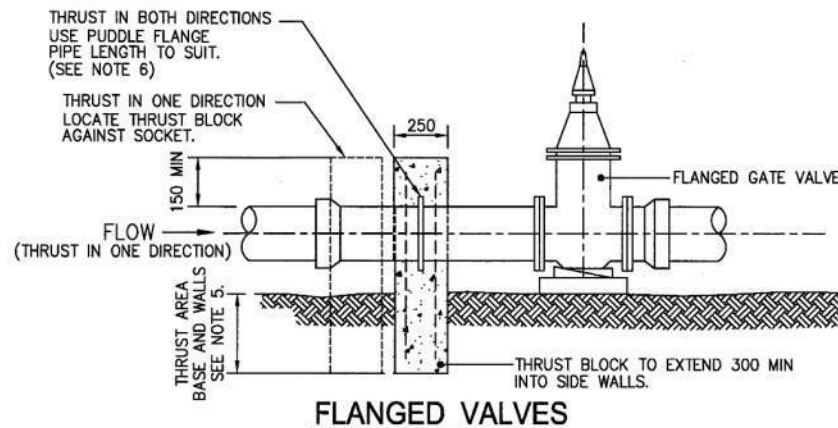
WS - 001 Typical mains construction - Reticulation main arrangements
